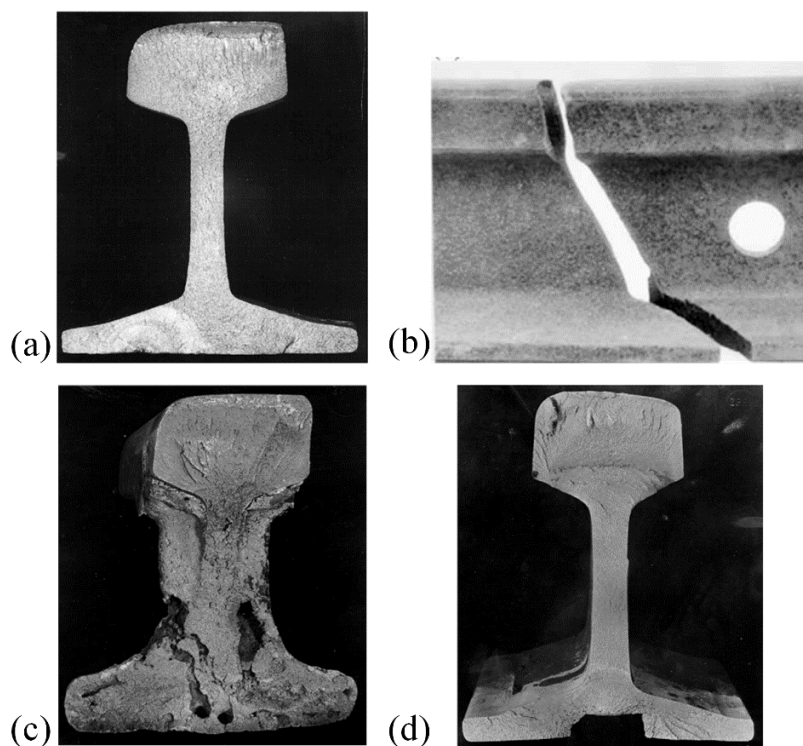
(a) Transverse rail foot crack initiating at a corrosion pit; (b) side view of a fracture due to a longitudinal crack in the foot; (c) fracture of an alumina-thermite weld due to the weld crack in the foot; (d) fracture caused by a crack initiated at a cutout in the foot [25].
